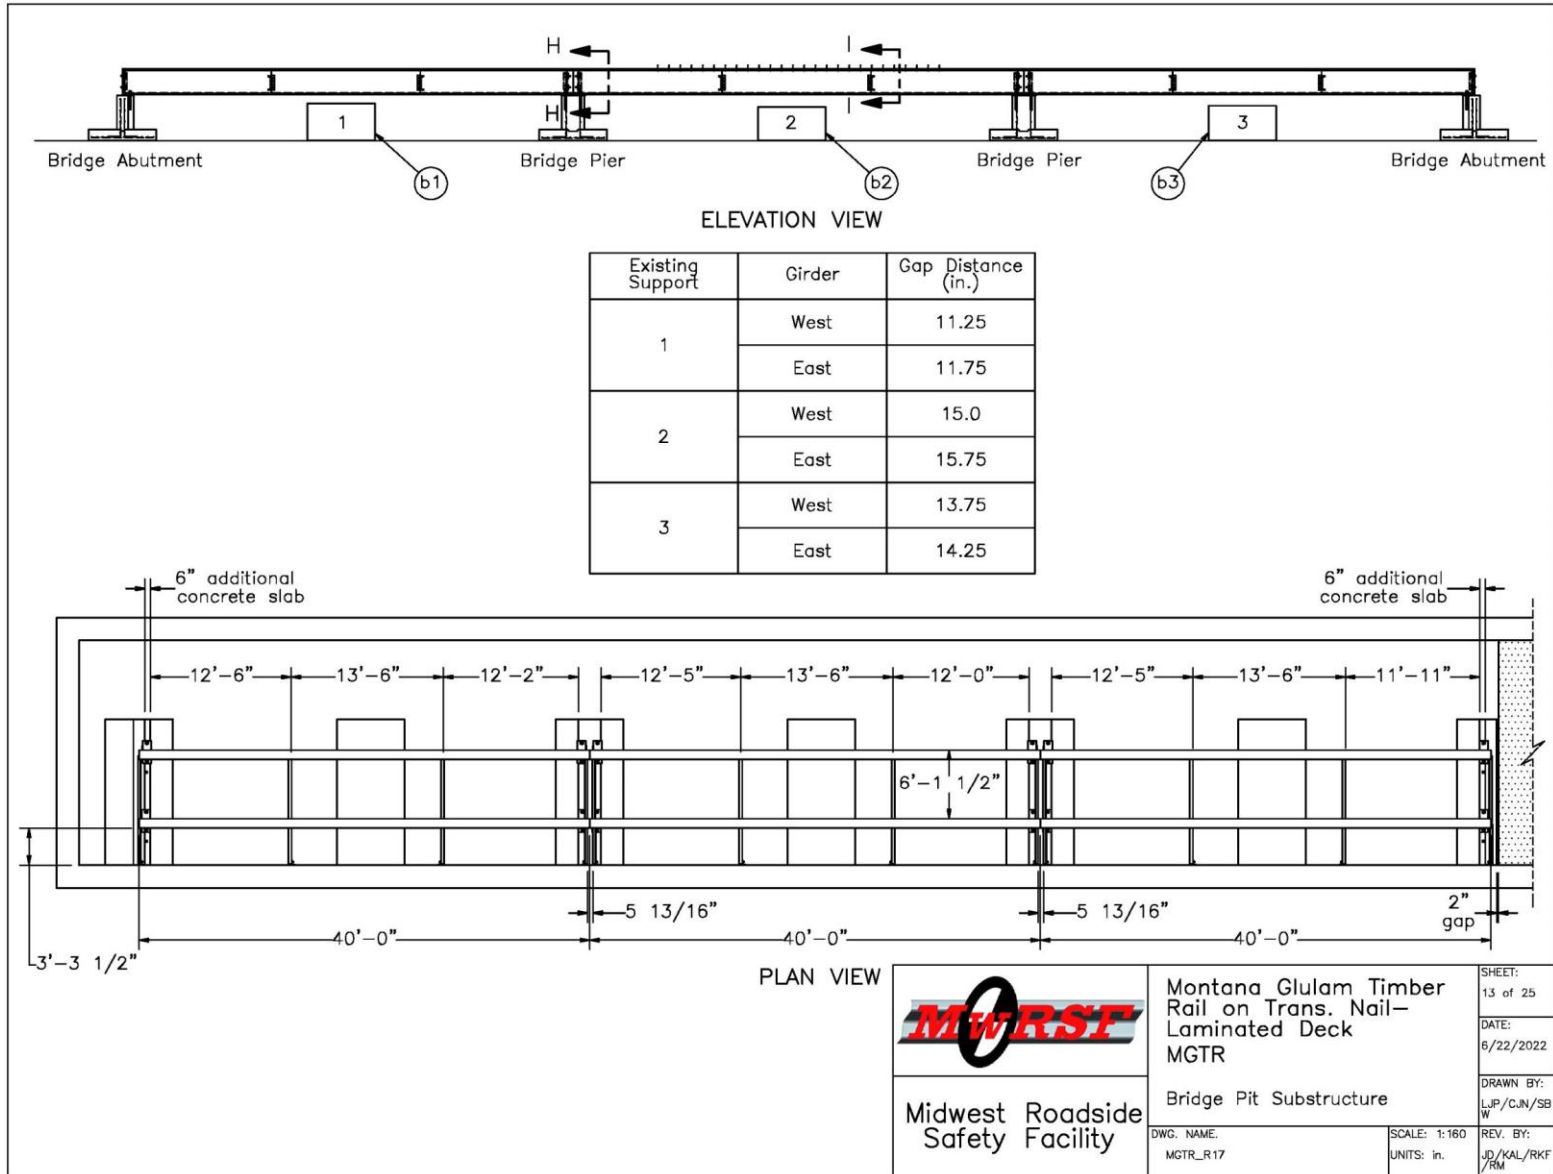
Bridge Pit Superstructure and Substructure, Test Nos. MGTR-1S and MGTR-1D
